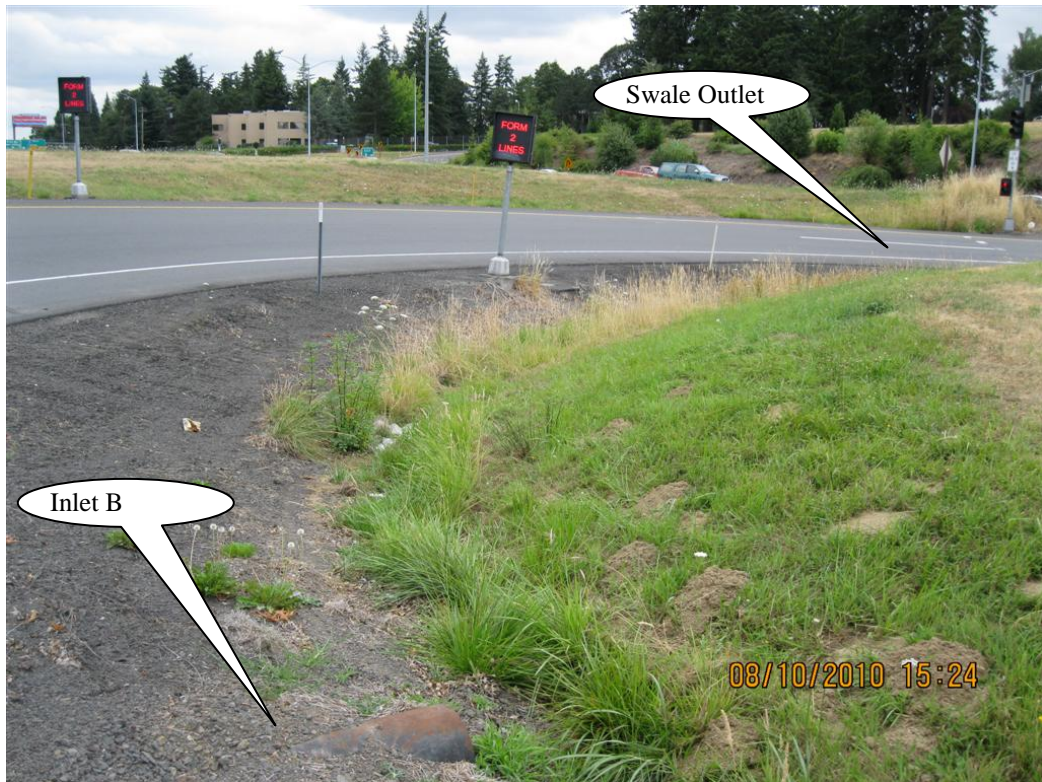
WQ Swale looking southwest at onramp to northbound OR 217 (Hwy 144). Inlet B is located in foreground.
